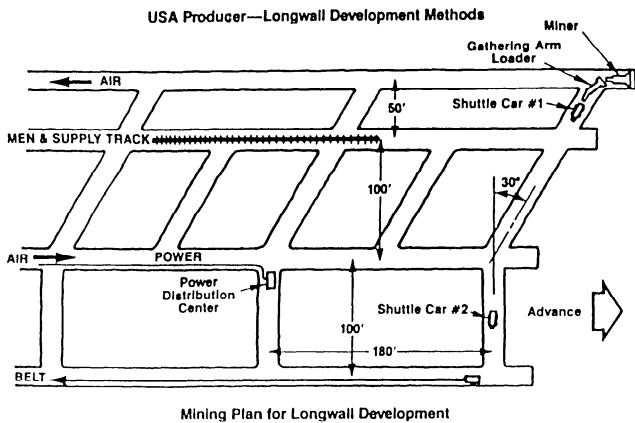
Typical development plan for rapid longwall development, with use of continuous face haulage. Conversion factor: 1 ft = 0.3048 m.
